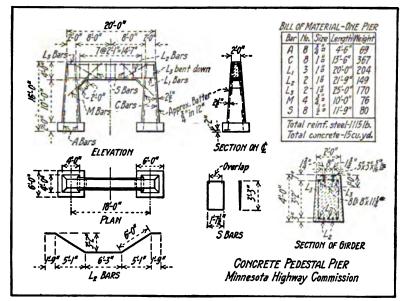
CONCRETE PEDESTAL PIER. MINNESOTA HIGHWAY COMMISSION.
